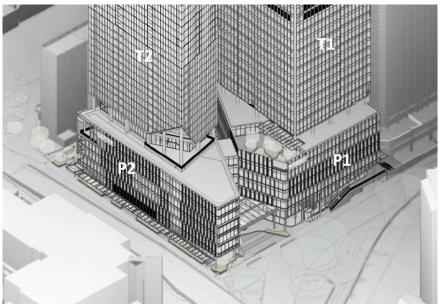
Aerial view showing the form of the podium and its relation to the street and adjoining buildings.
